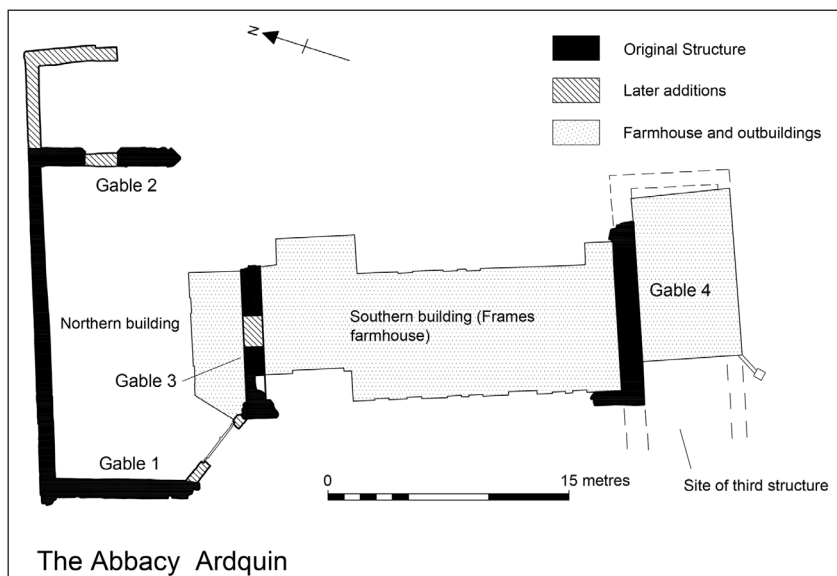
Plan of surviving ruins and farmhouse showing doorways at ground-floor level.
